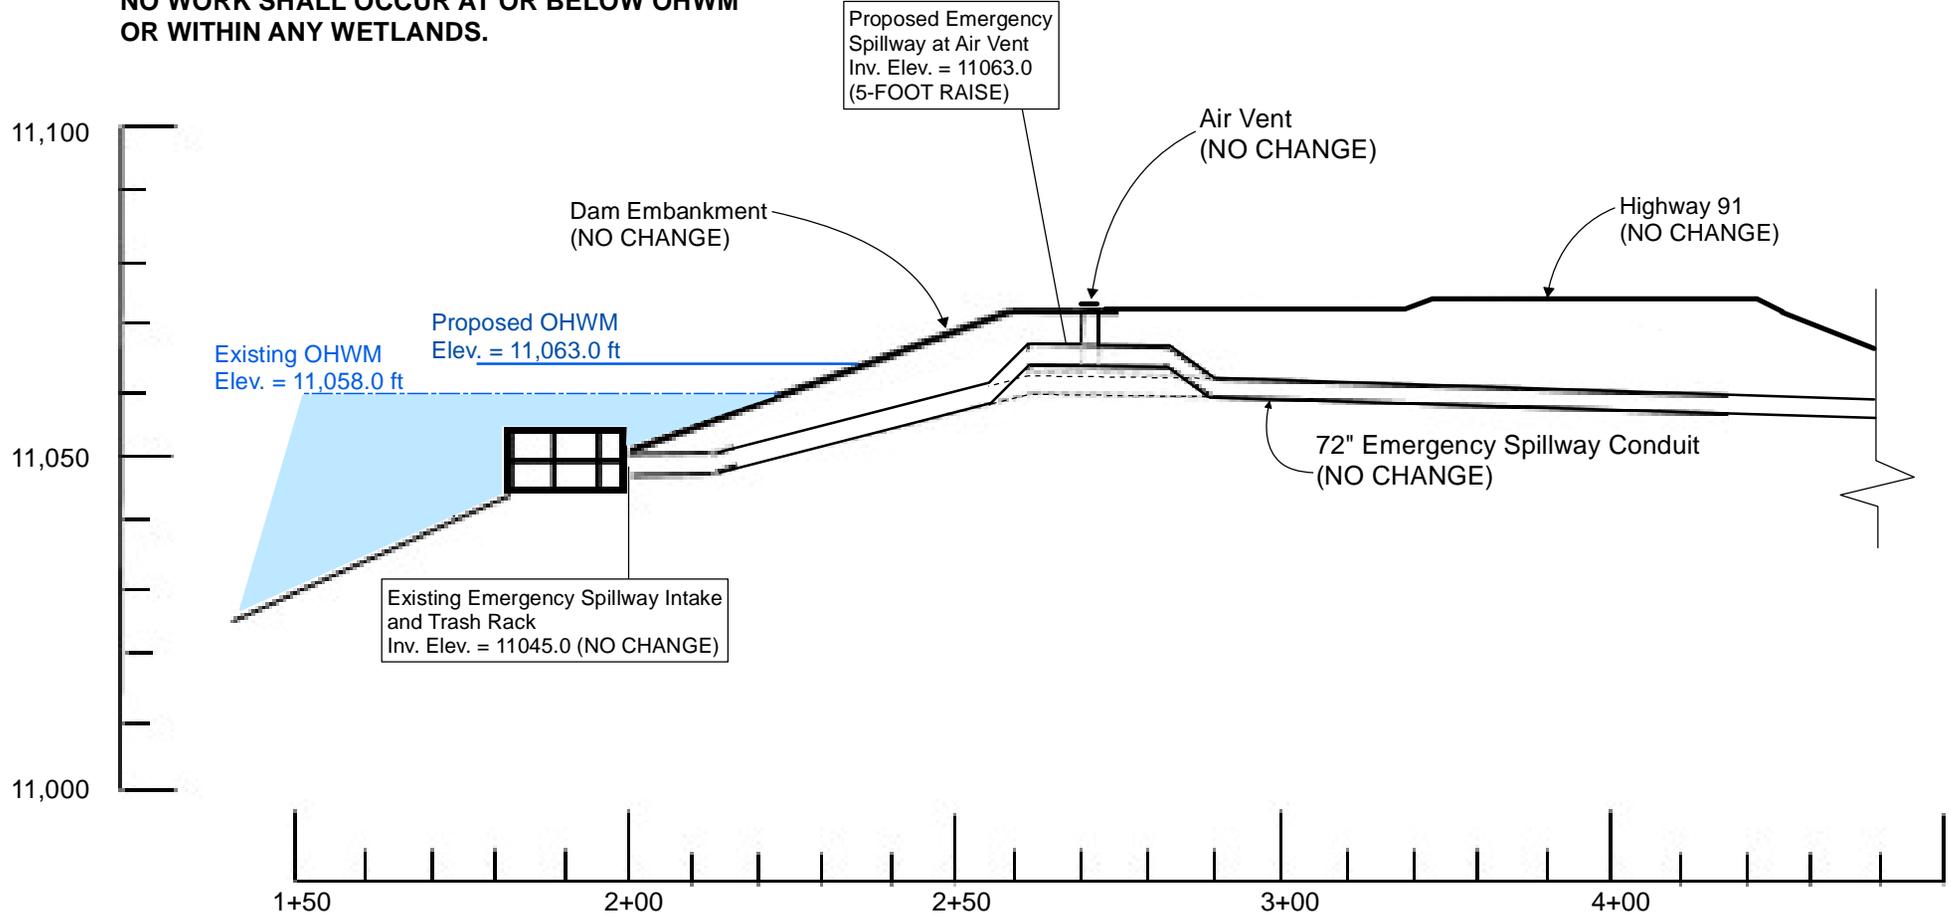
Profiles of Outlet and Emergency Spillway Conduits
